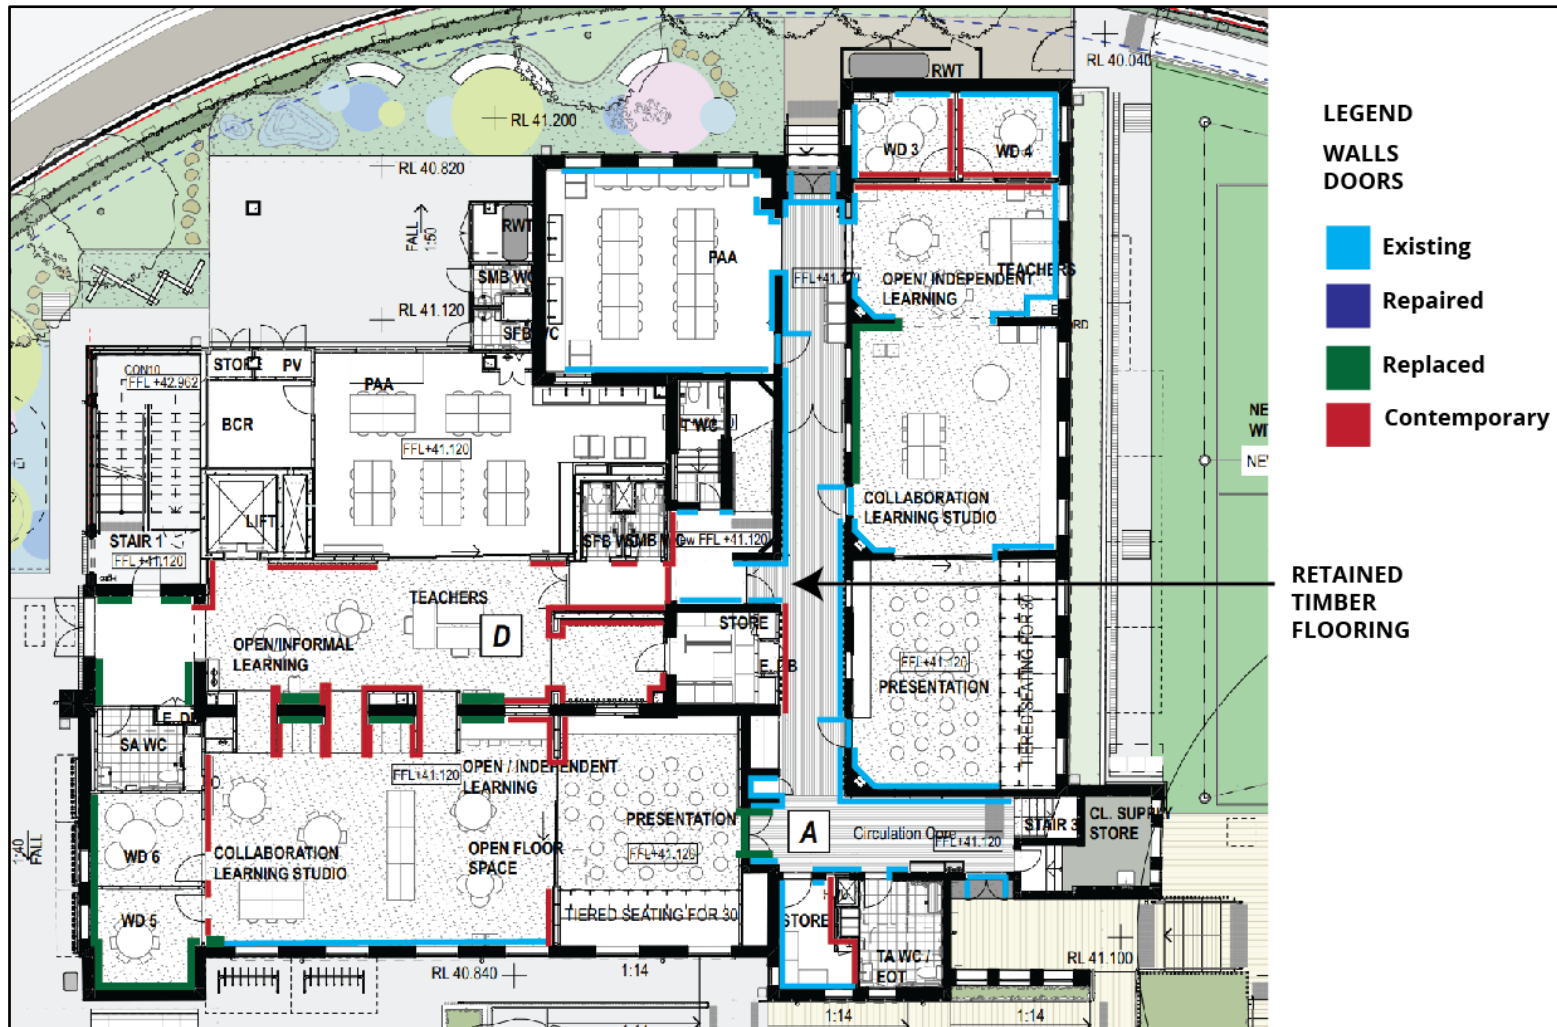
Fort Street Public School Building Ground floor plan – existing, repaired, replaced, contemporary fabric with Curio Overlay. FJC Studio
